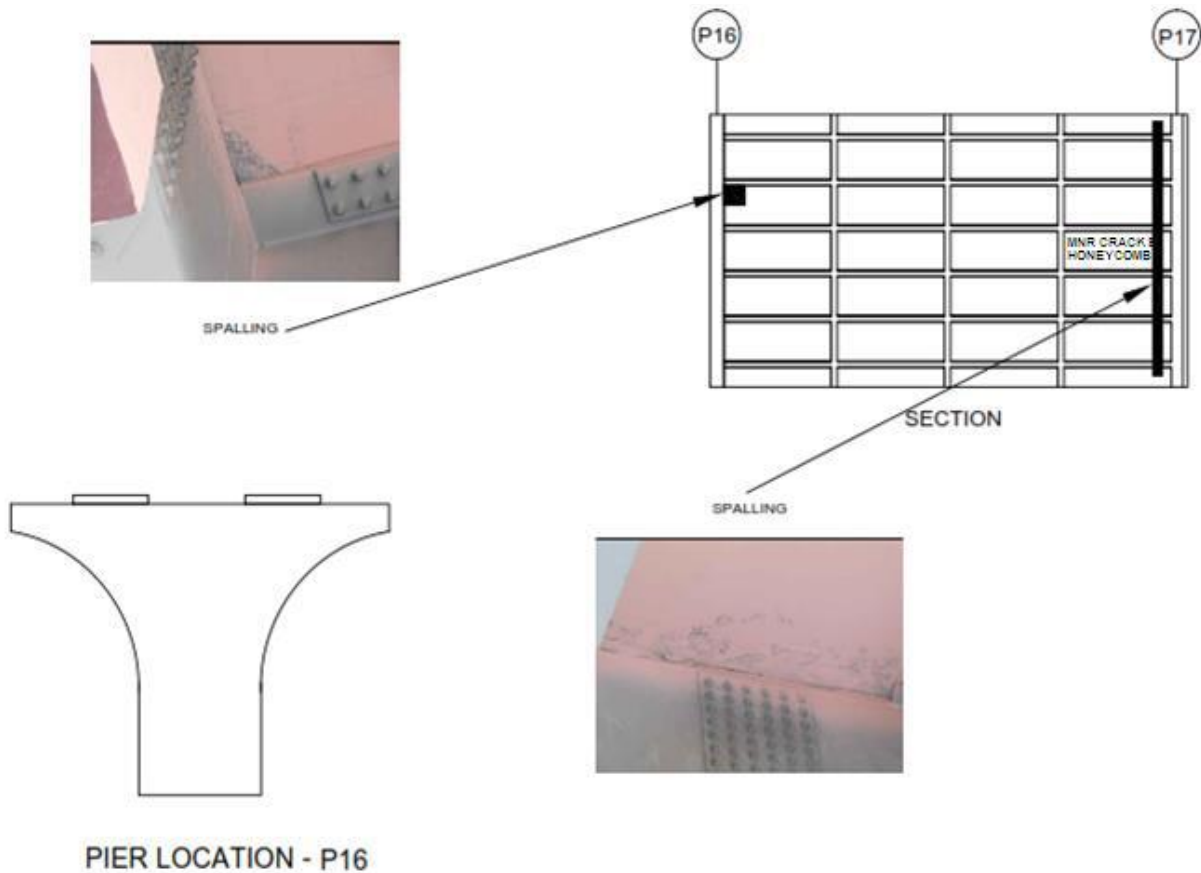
Minor cracks with spalling noted in between P16-P17
